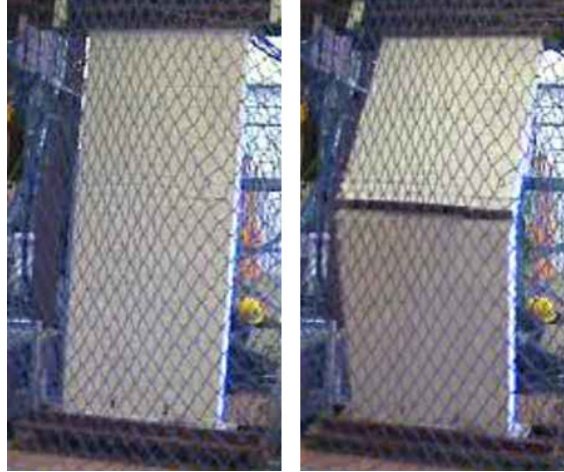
135 Wall W#7 at the beginning of the test (left) and failing (right)
